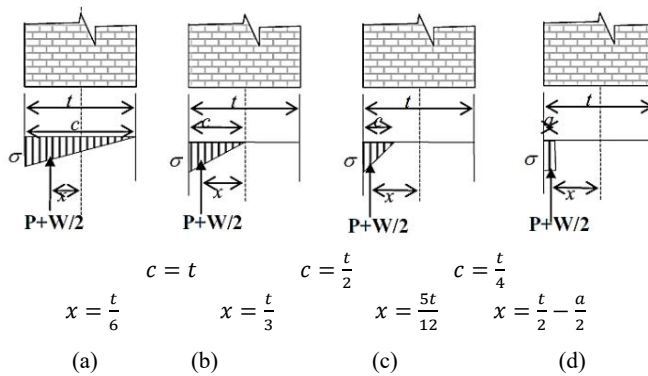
Compressive stress distribution at mid-height of masonry wall [25]
